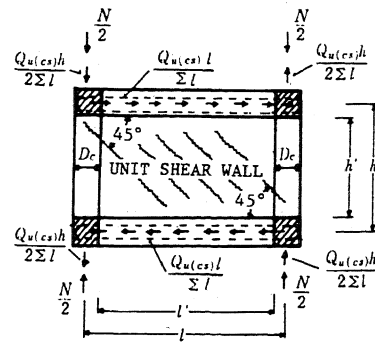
External forces assumed to apply to unit shear wall in derivation of Eq. 2
